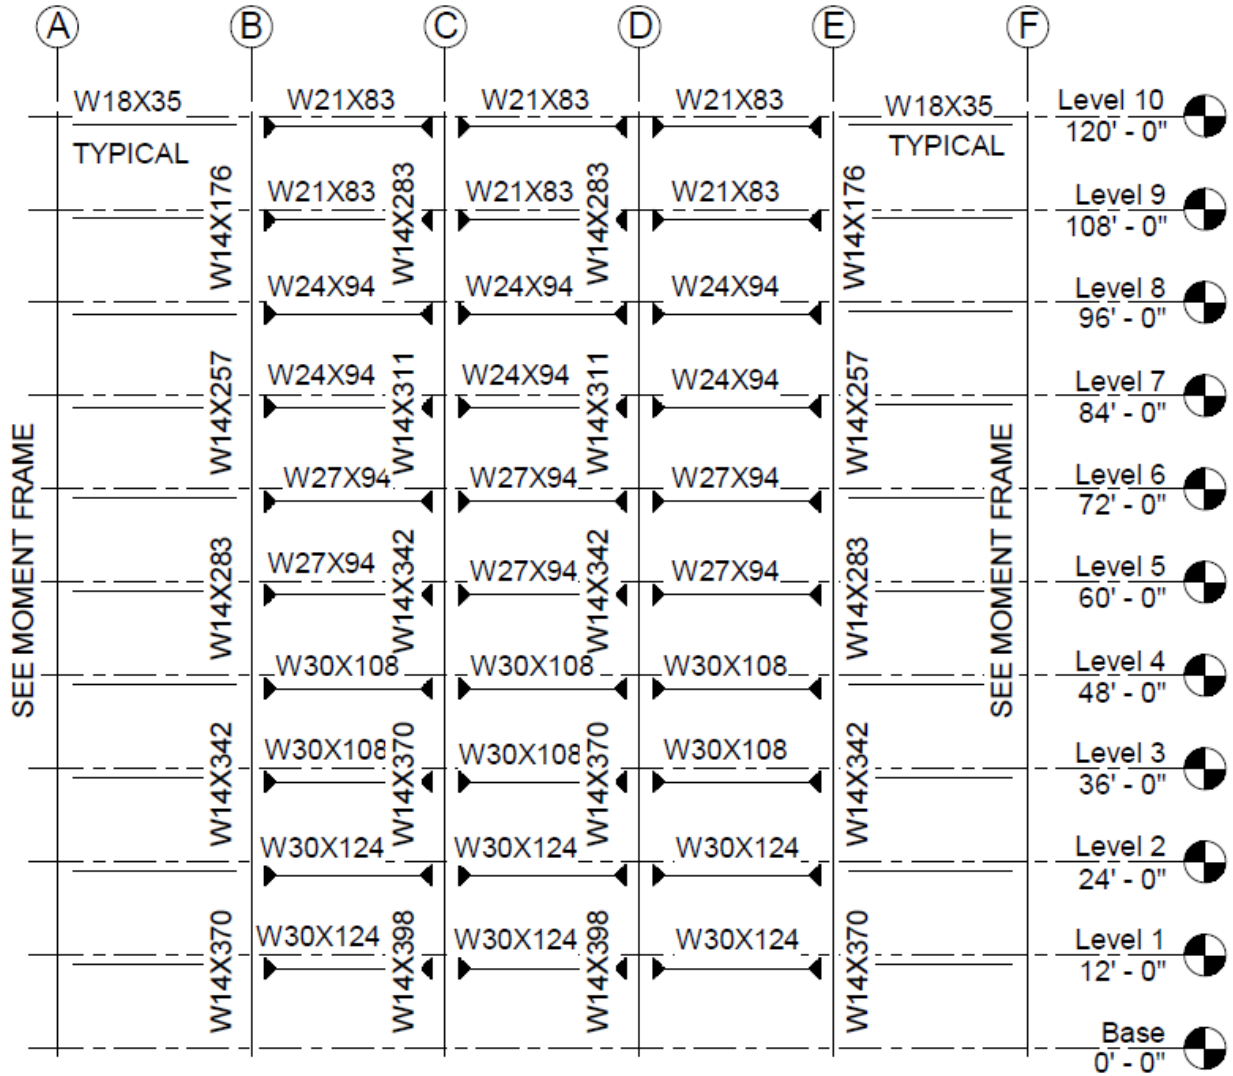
Moment frames in Los Angeles building at gridlines 1 and 4
